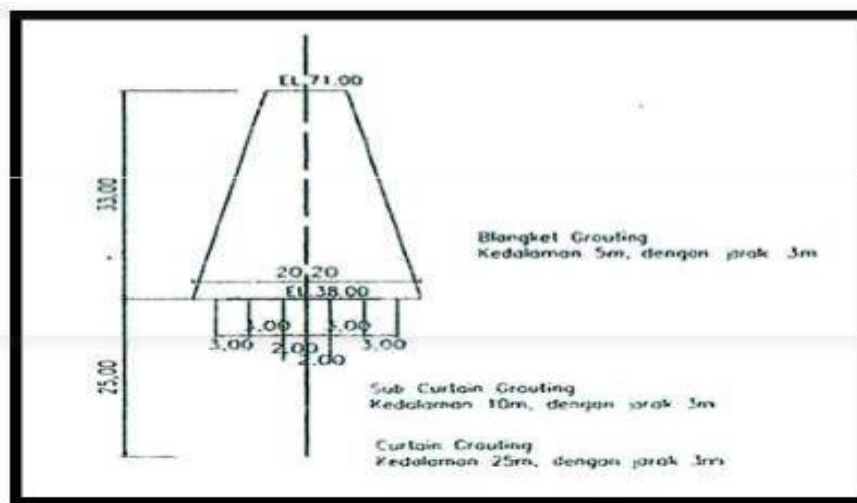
Design of the Initial Grouting Point Drilling Plan
